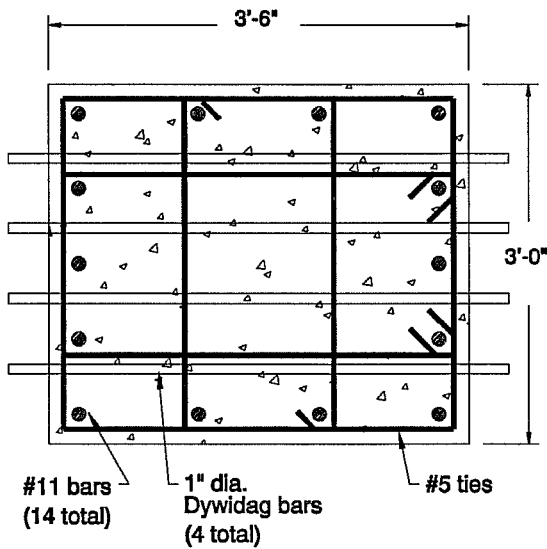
(cont'd) Typical Beam and Column Cross-Sections for 15-Story Prototype Structure.
